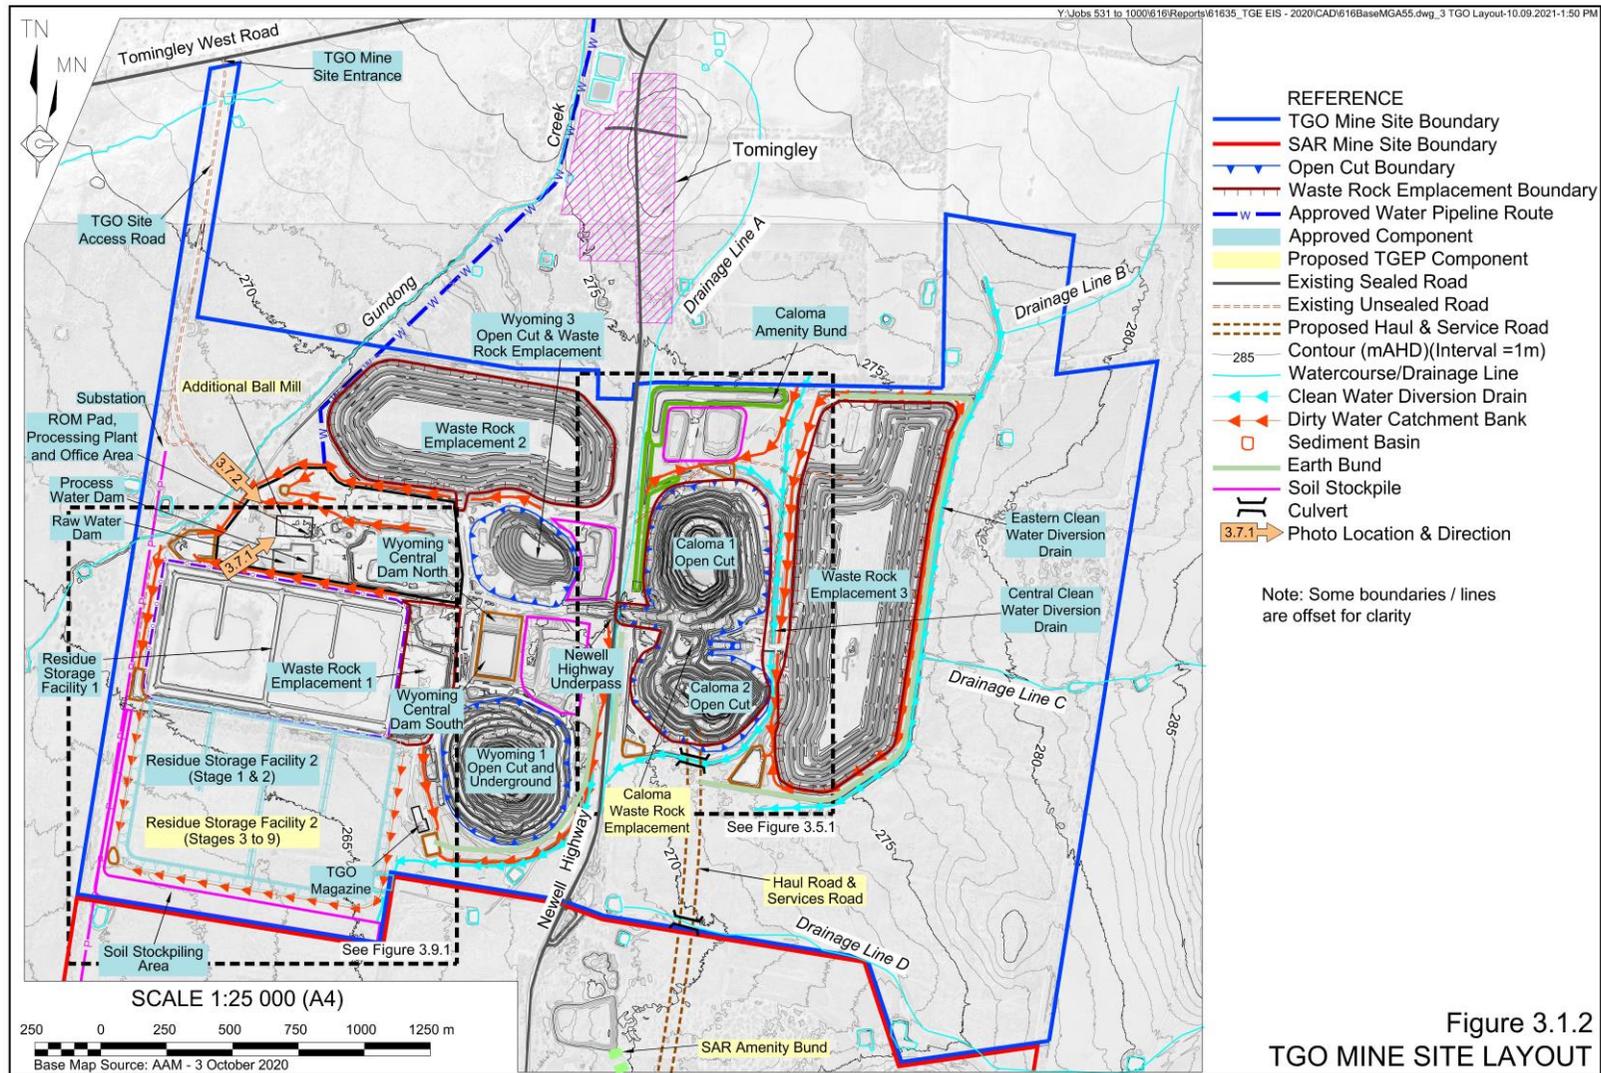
TGO mine site layout (Source: RW Corkery & Co, 2021)
